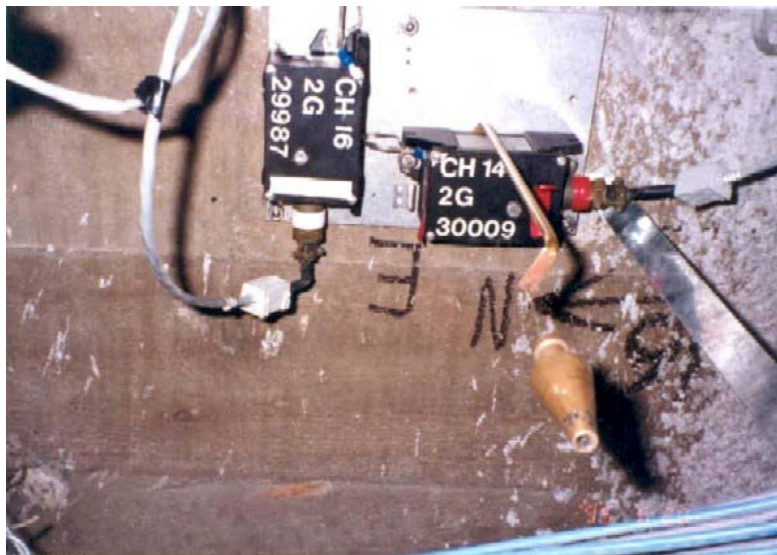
Sensors 14 and 16 installed on the underside of the 7th Floor slab at the Oakland City Hall to measure horizontal motions. The plumb bob in the photo indicates vertical direction.
